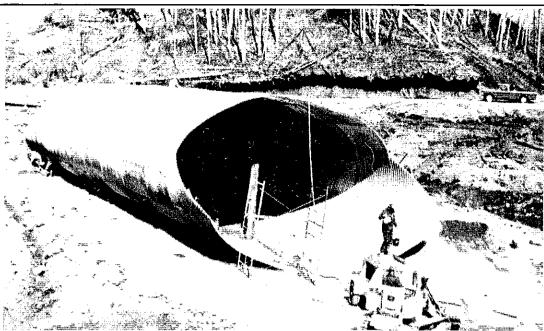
Big Mountain Creek culvert - assembly of culvert.
